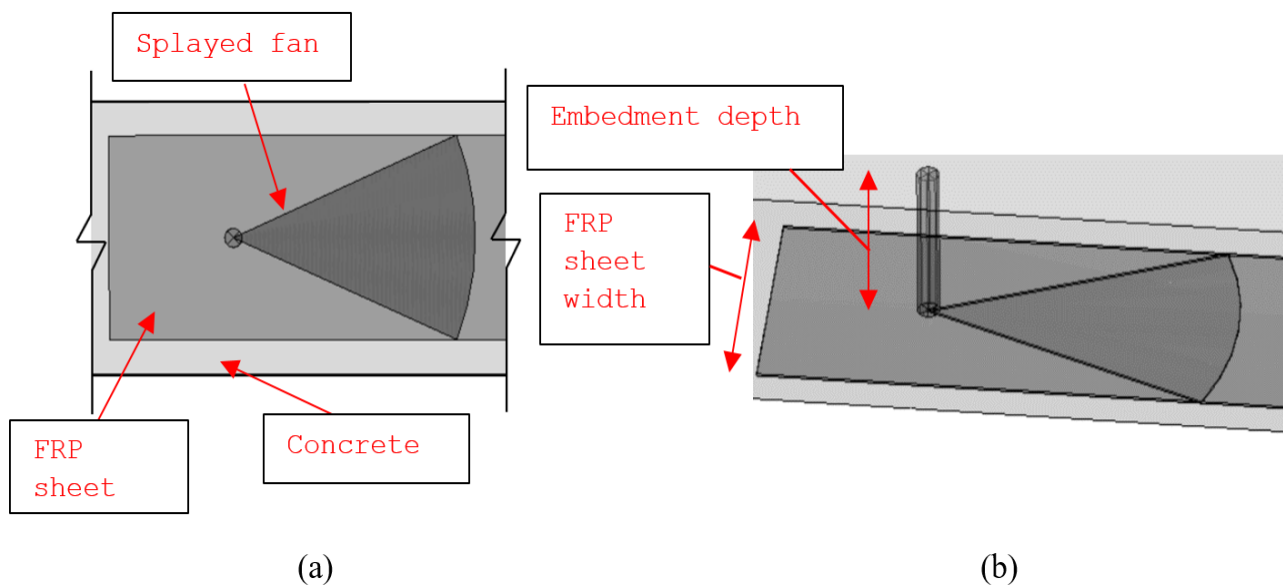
Schematic of CFRP spike anchor in FRP-strengthened concrete. (a) Bottom view of anchored sheet. (b) 3-D view inside strengthened and anchored concrete.
